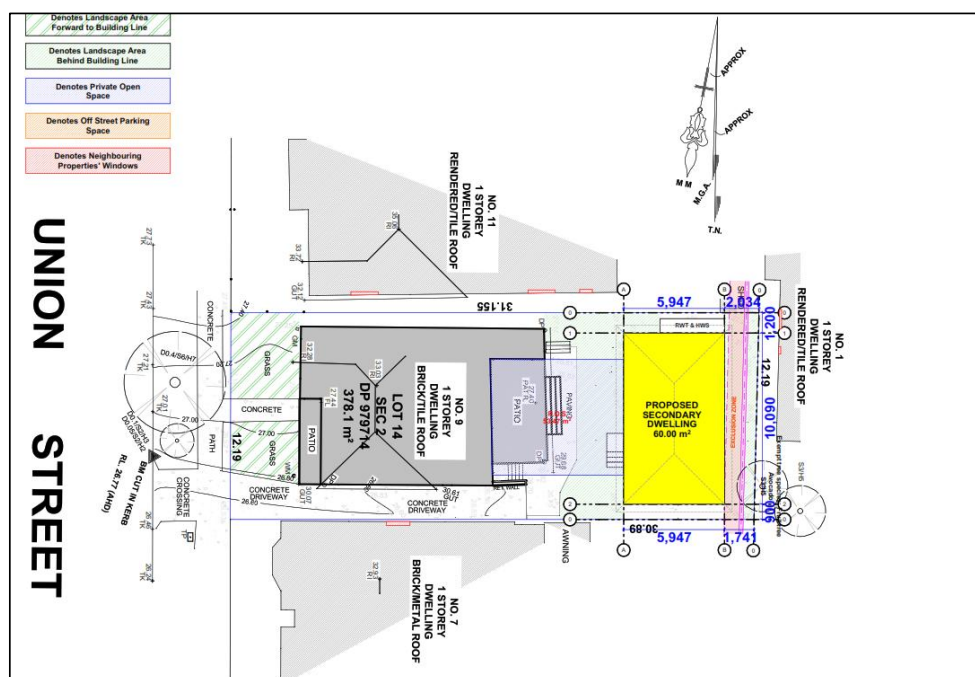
Proposed site plan and landscape plan prepared by the applicant.
